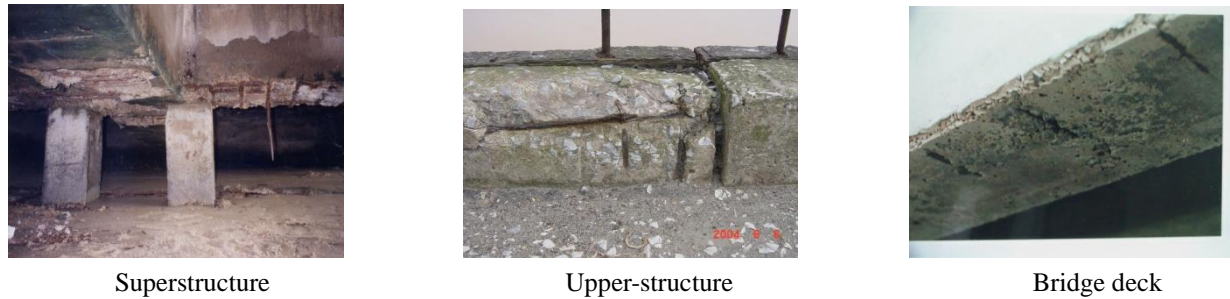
Chloride damage of existing concrete bridges in Vietnam
